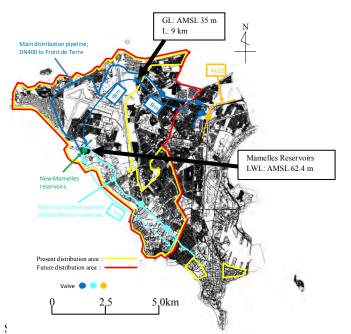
Layout of the Existing DN 400 and the Plan of the Additional Main Distribution Pipeline
